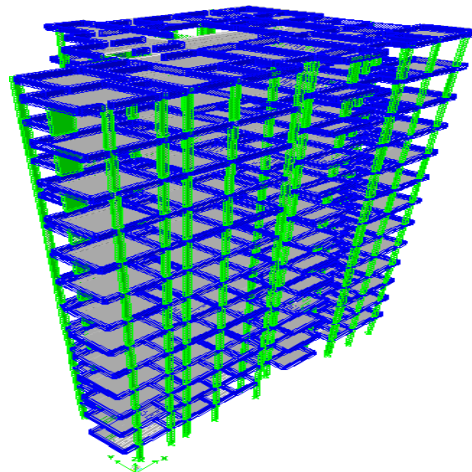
MODEL-1 floor plan of Bare Frame (Beam Column Frame) Structure
